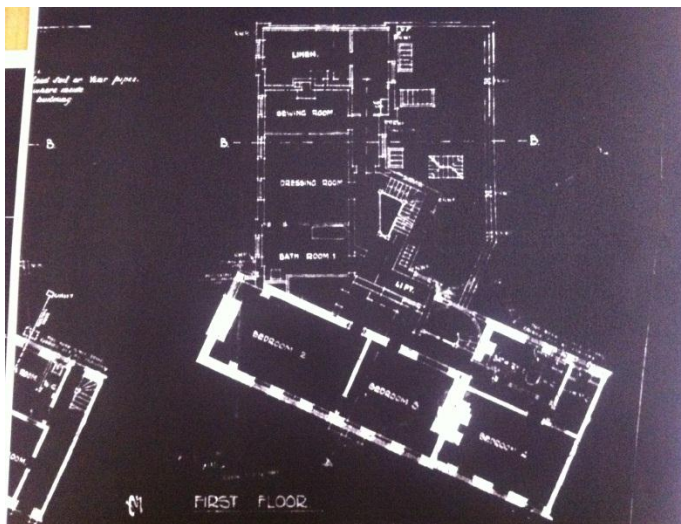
First floor plan, Upper Terrace Lodge, 1920.
